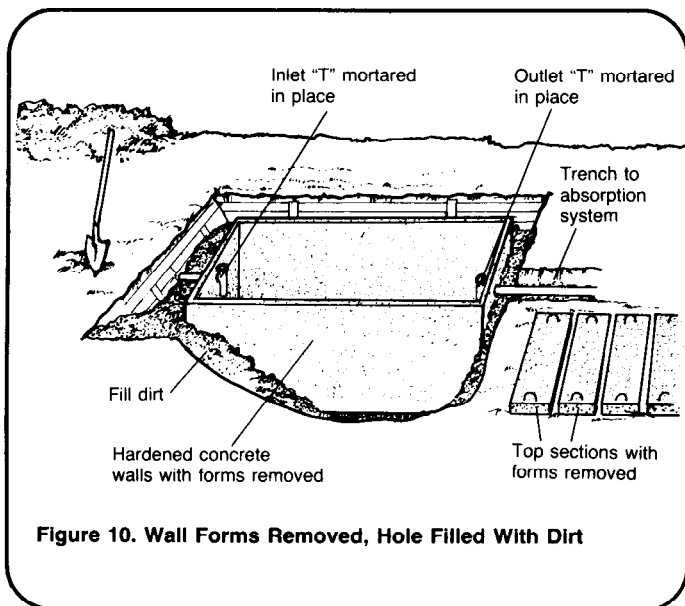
Wall Forms Removed, Hole Filled With Dirt
